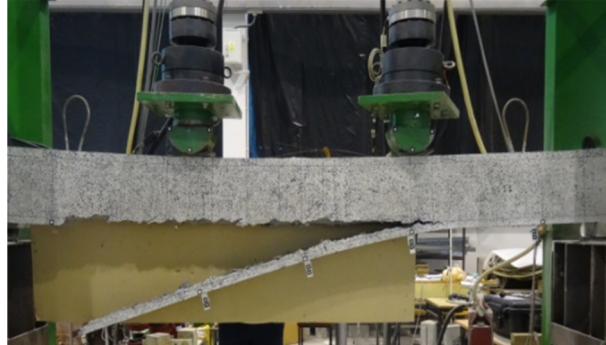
Failure mode by horizontal crack propagation and peeling of concrete cover
